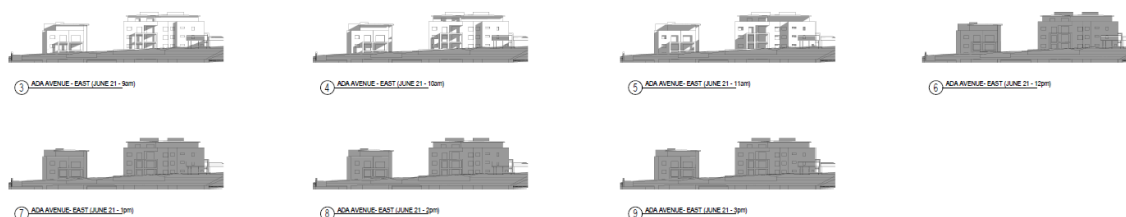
Existing solar impacts 21 June 10 Ada Street (East)
